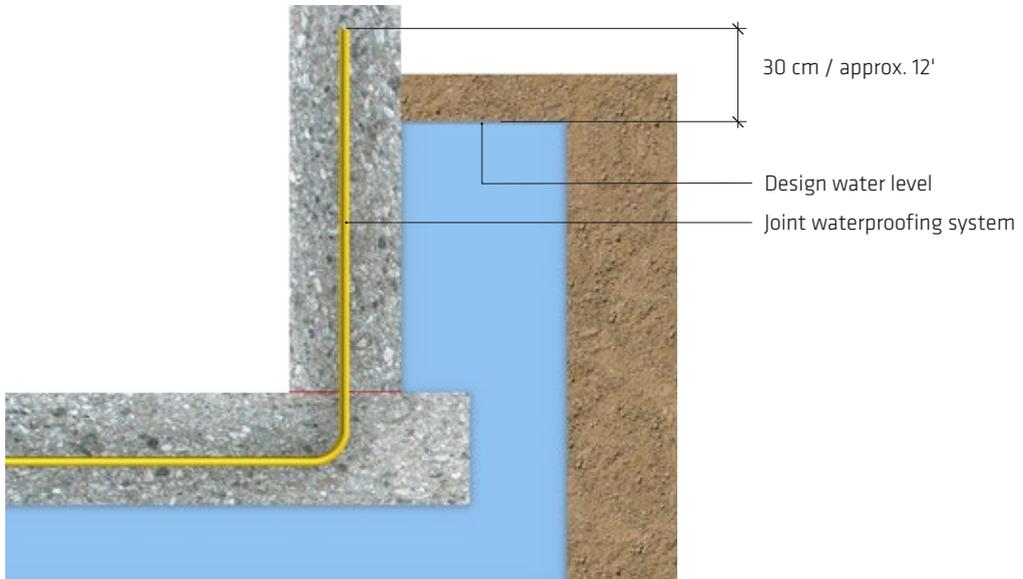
Minimum height of the joint waterproofing system above the critical water level (design water level)
